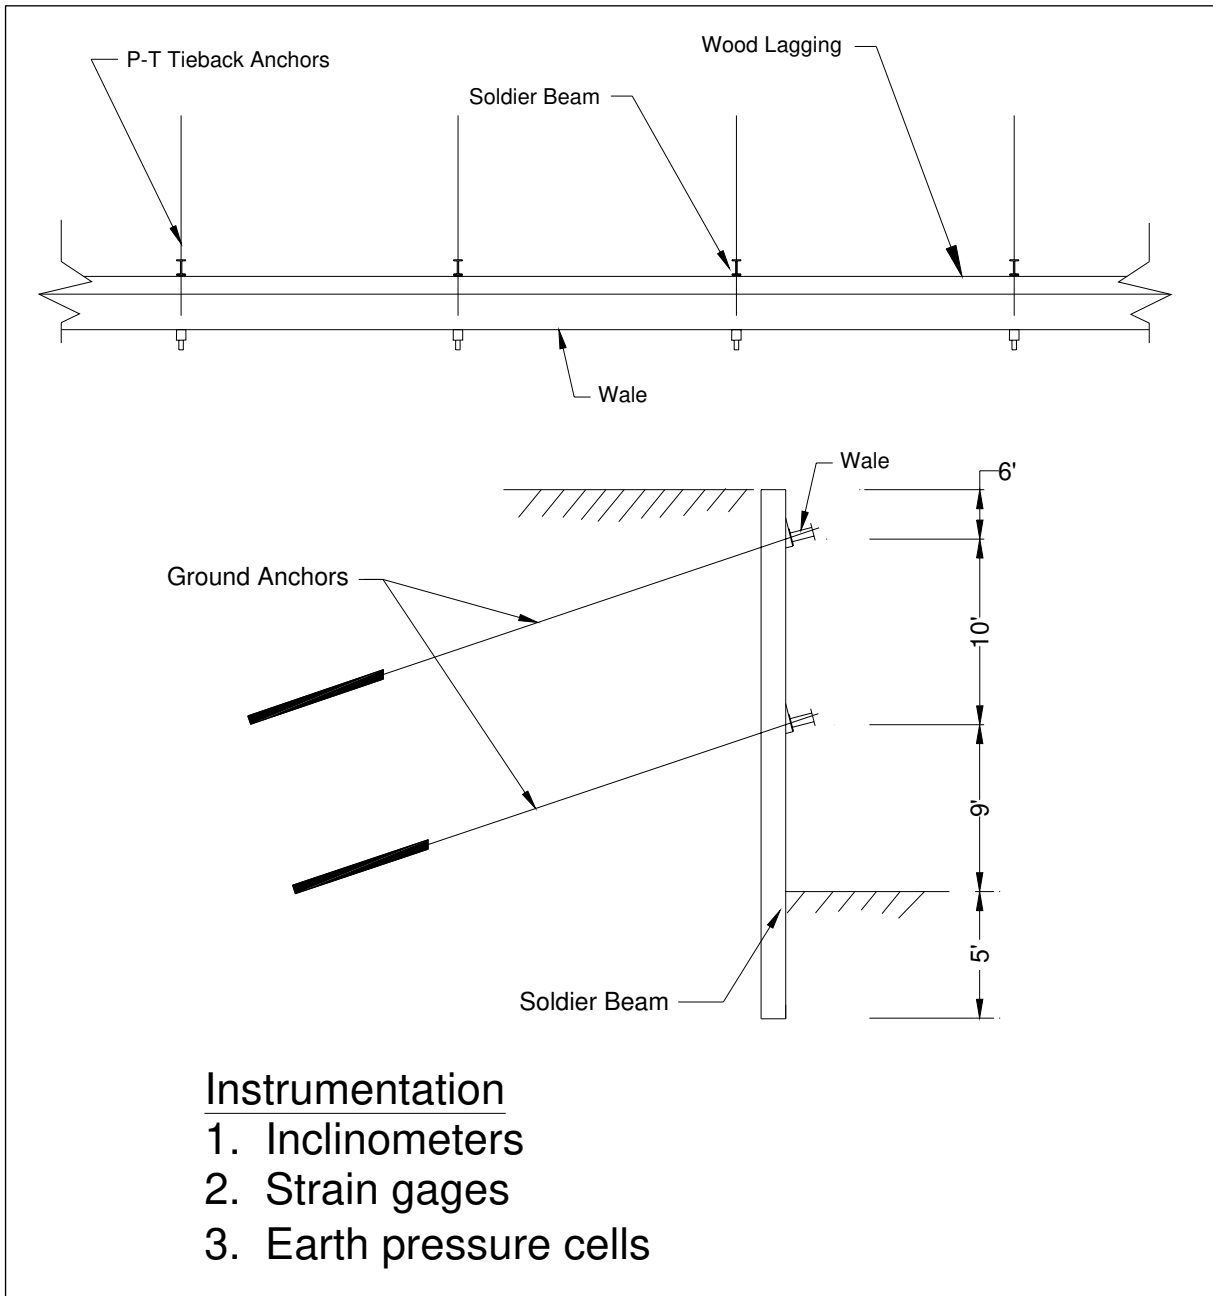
Plan and section view of flexible soldier beam and lagging with post-tensioned tieback anchors
